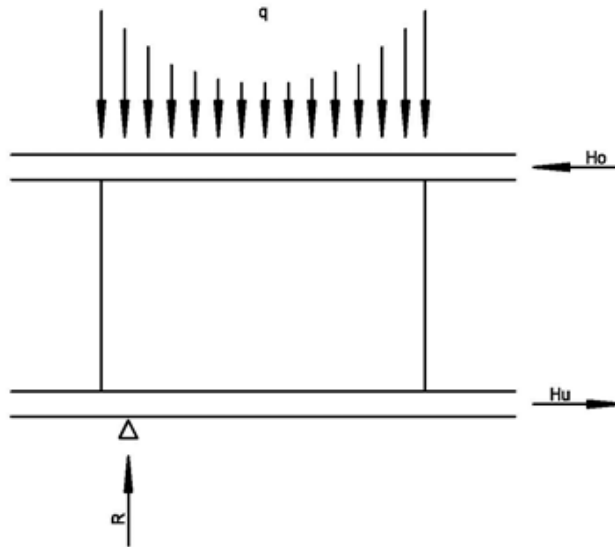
Schematization of the equilibrium of a wall supported eccentrically (drawing by Jürg Conzett)
